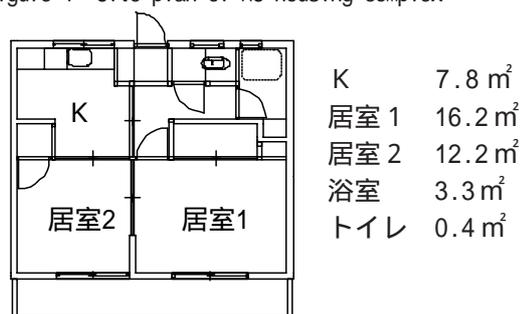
Dwelling unit plan (34.56 m<sup>2</sup>)
